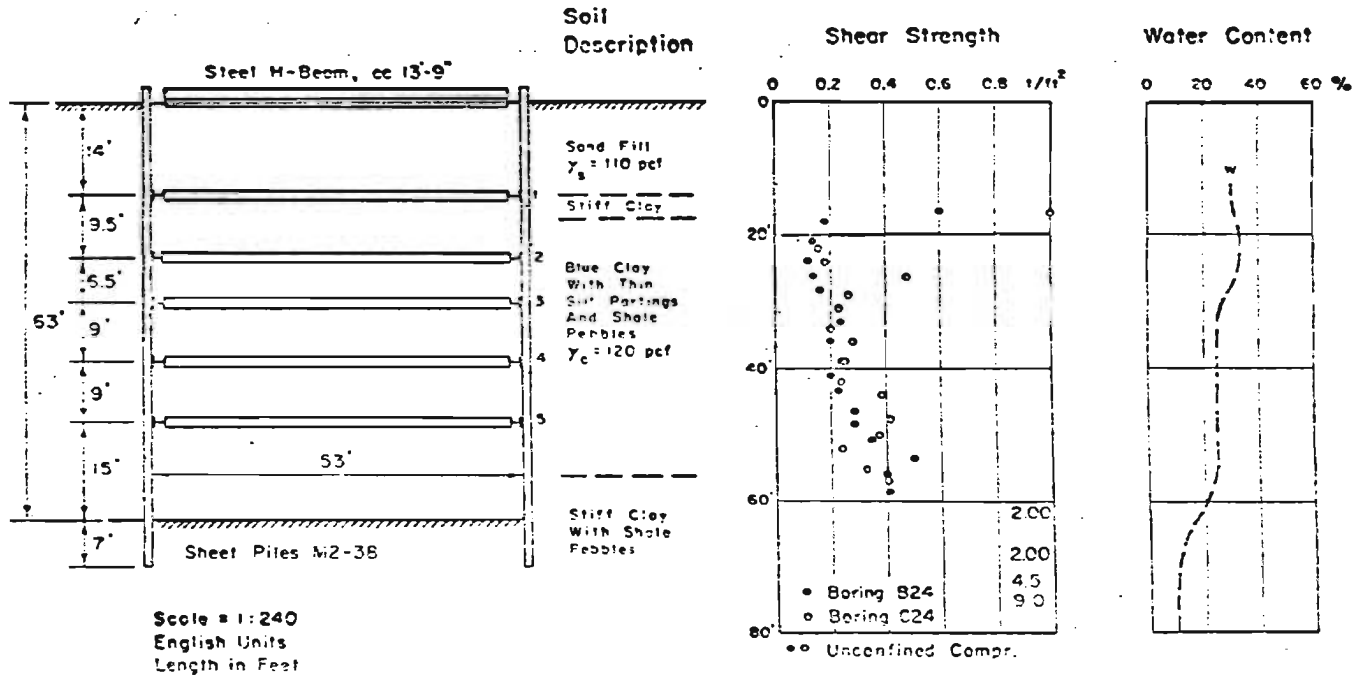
Chicago Subway, D8, Cross section and soil properties.
